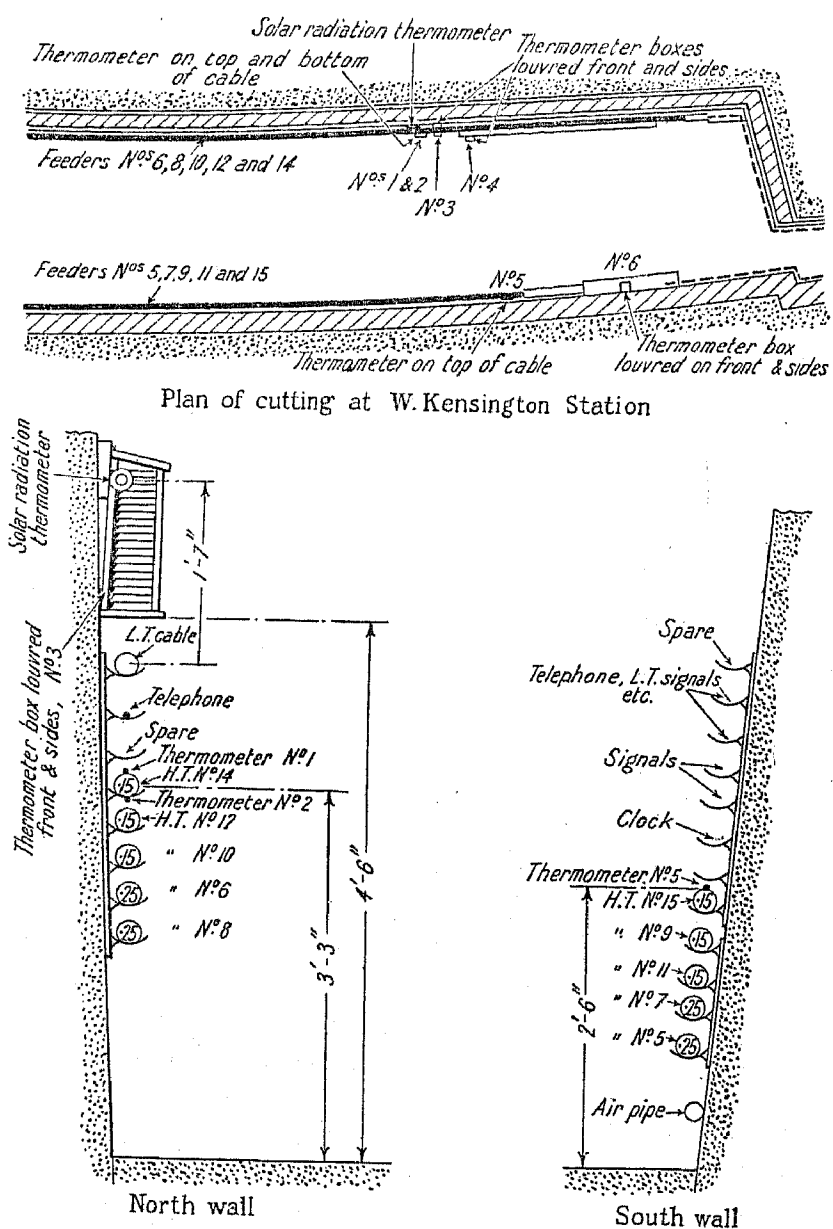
Plan and section showing elevation of walls of cutting at West Kensington station.
